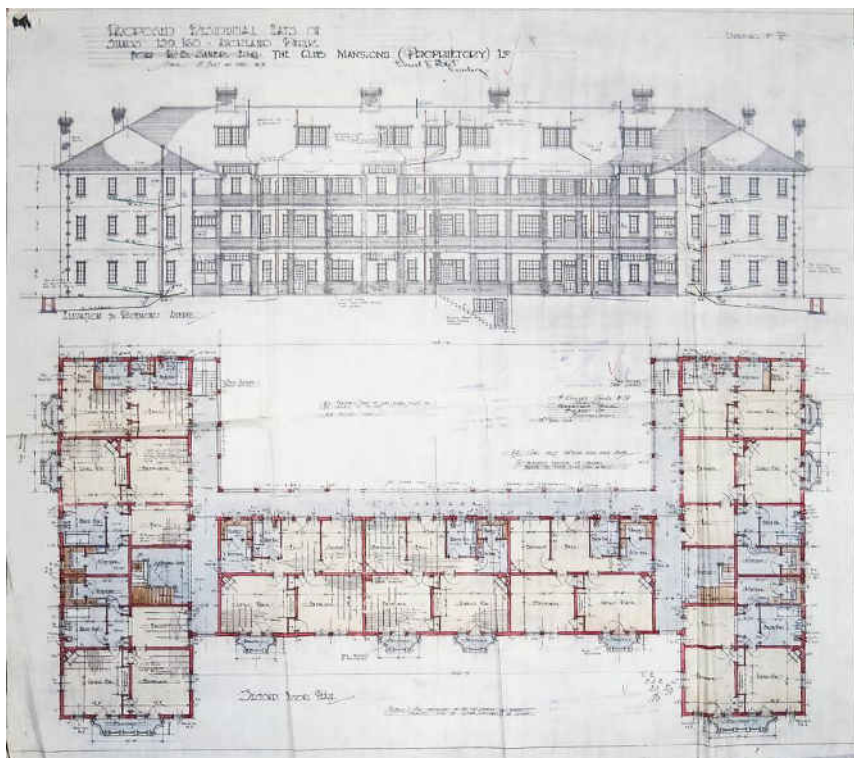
Original plan for proposed residential flats along Kingsway Avenue from 1928\_ floor plan shows the originally designed three storey double wing flat block connected with a middle section facing Kingsway Avenue (Source: City Council of Johannesburg, Plans Archive)
